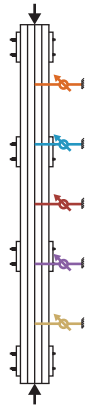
(opposite): Lateral deformations and column eccentricity measurements during full-scale column testing.
